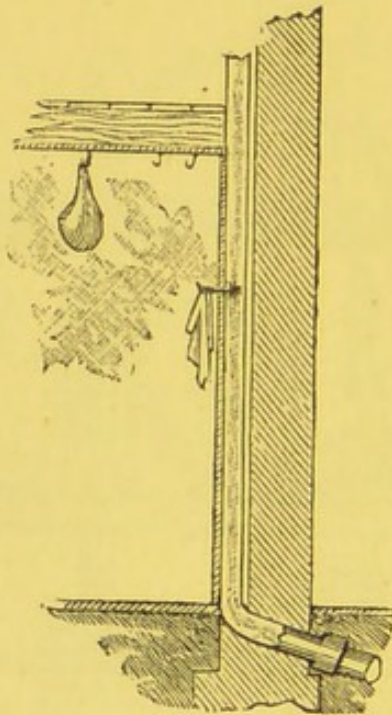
Nail driven into soil-pipe in larder wall. Foul air escaping into larder.
